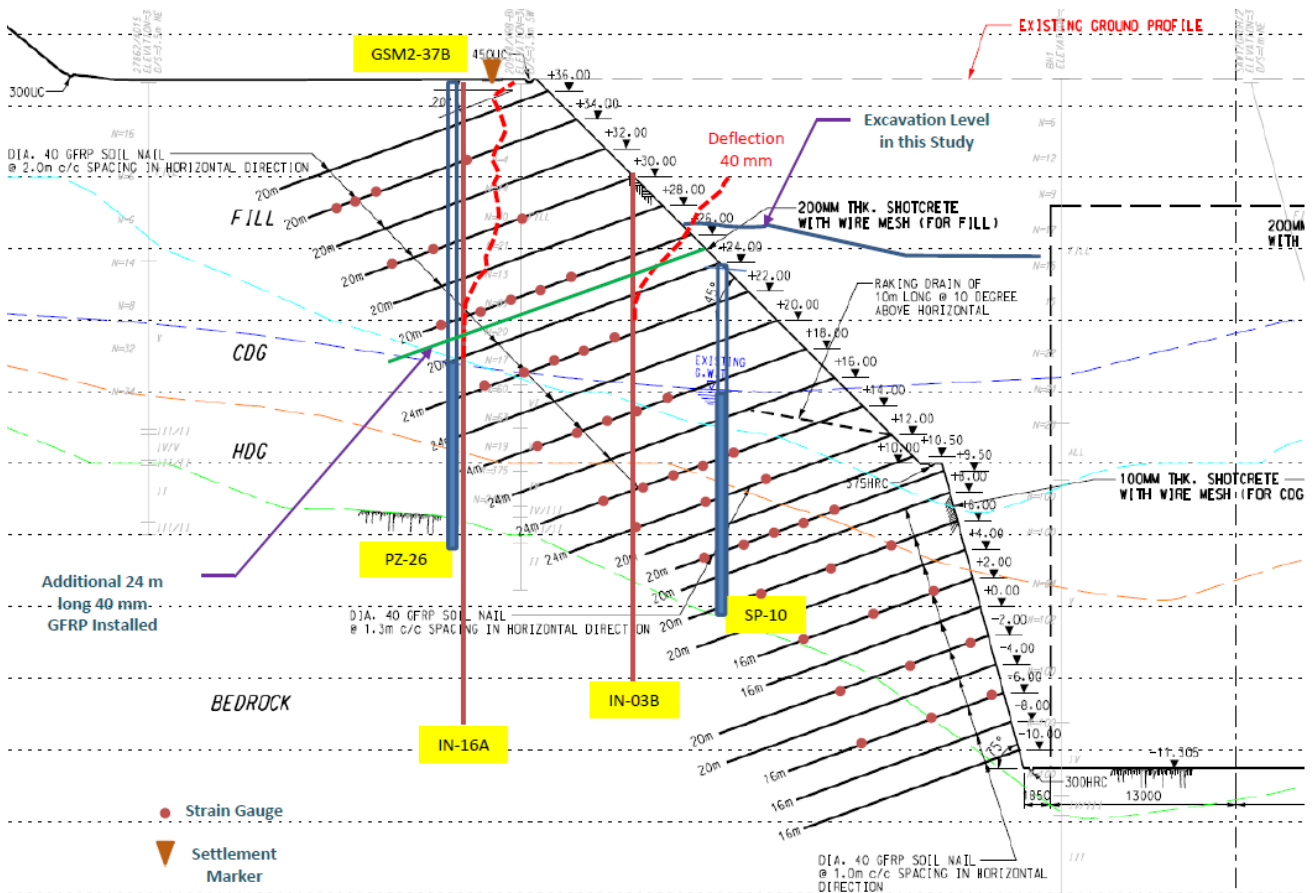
Typical Geology in Section 20 (Section A-A in Figure 1)
